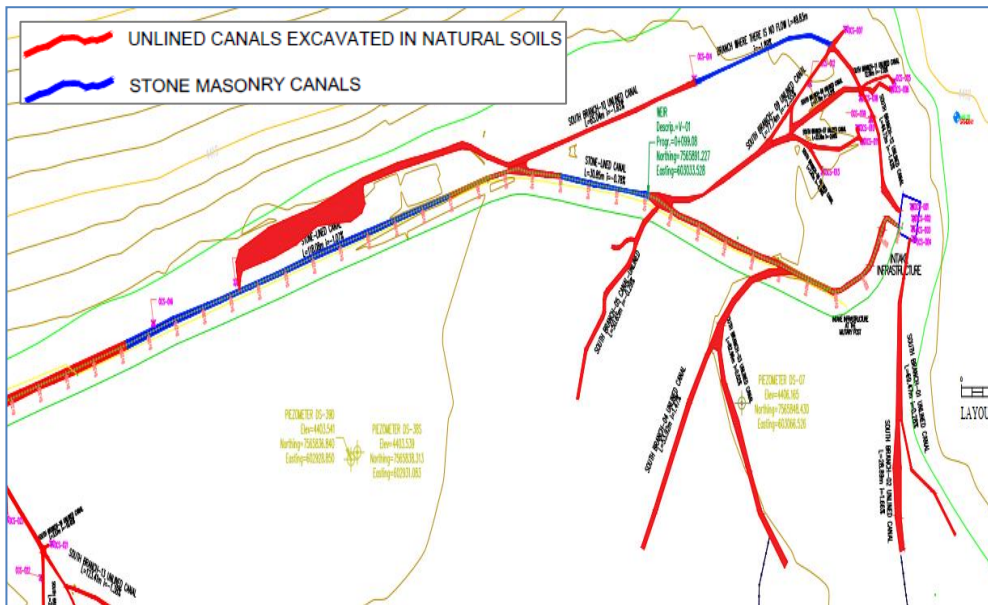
Layout Plan and Profile of the South Canal of the Silala N° 01-16.⁷⁴
